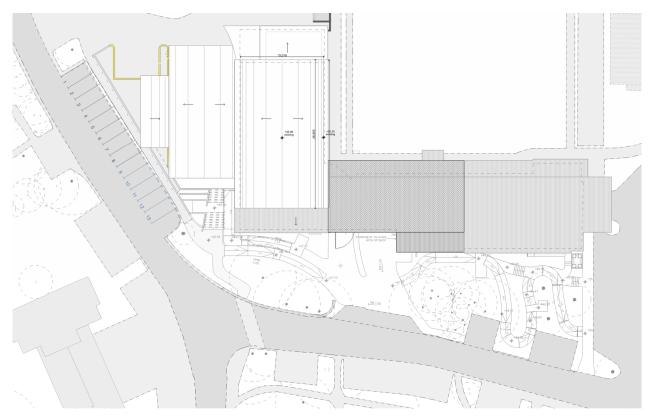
Architectural Proposed Site Plan dwg A100 (Source: McNally Architects)
